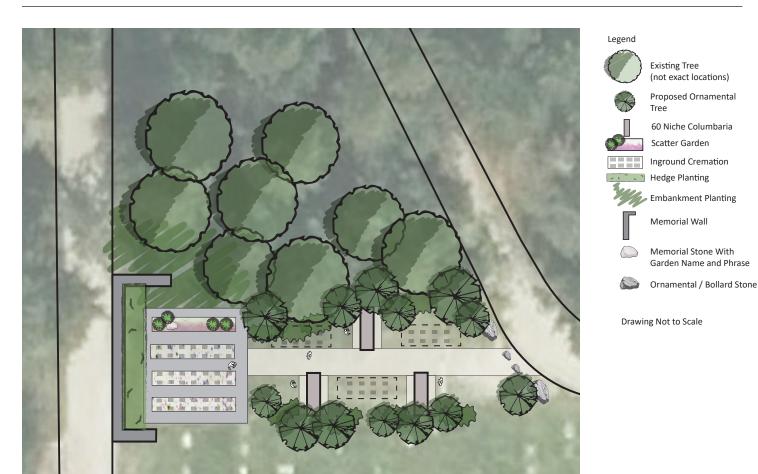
Memorial Wall and Upper Cremation Garden Schematic Plan, Not to Scale
